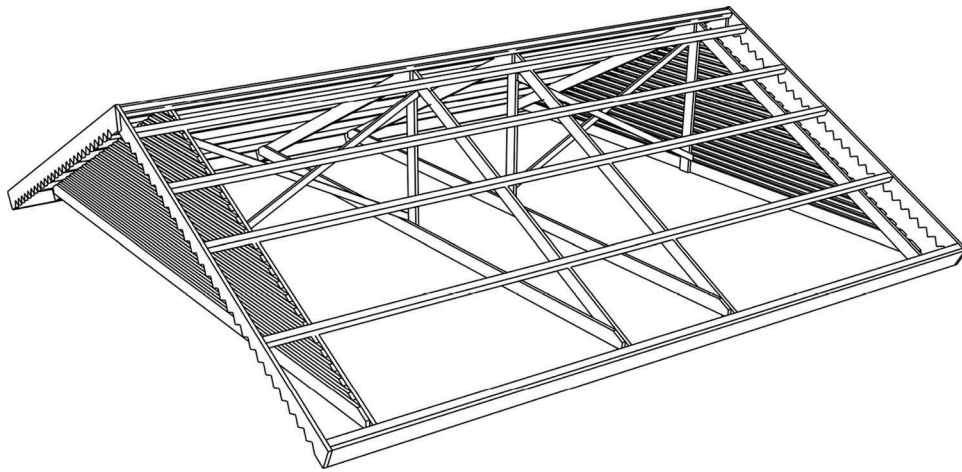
Roof truss dimensions (sketched by C. Belinga Nko'o).
